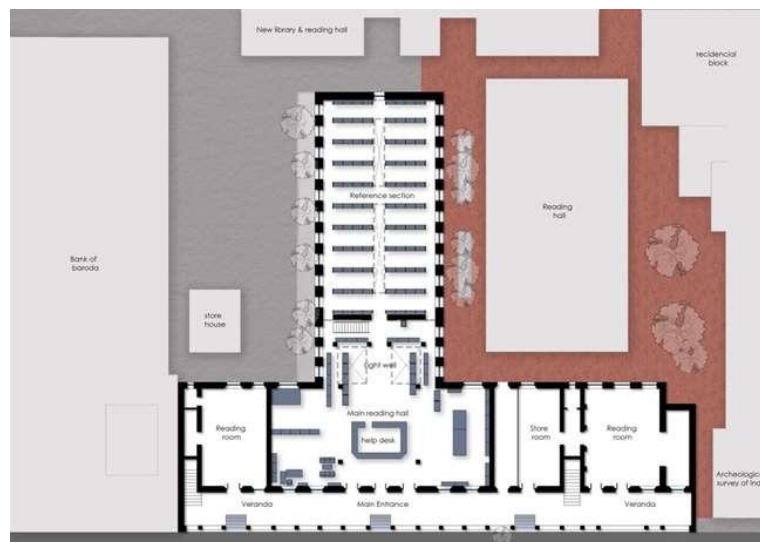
Ground Floor Plan showing the spatial organization of spaces.
